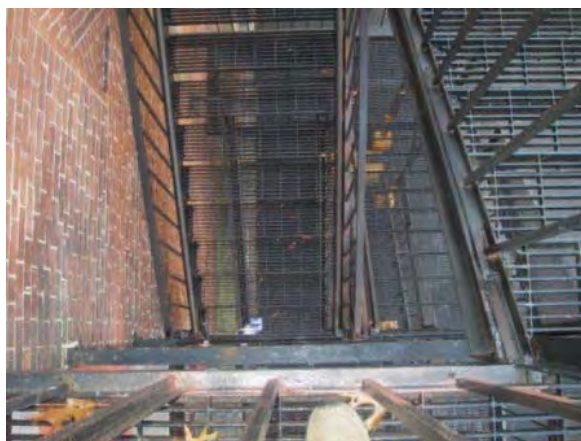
1902 BUILDING NORTH FIRE ESCAPE
